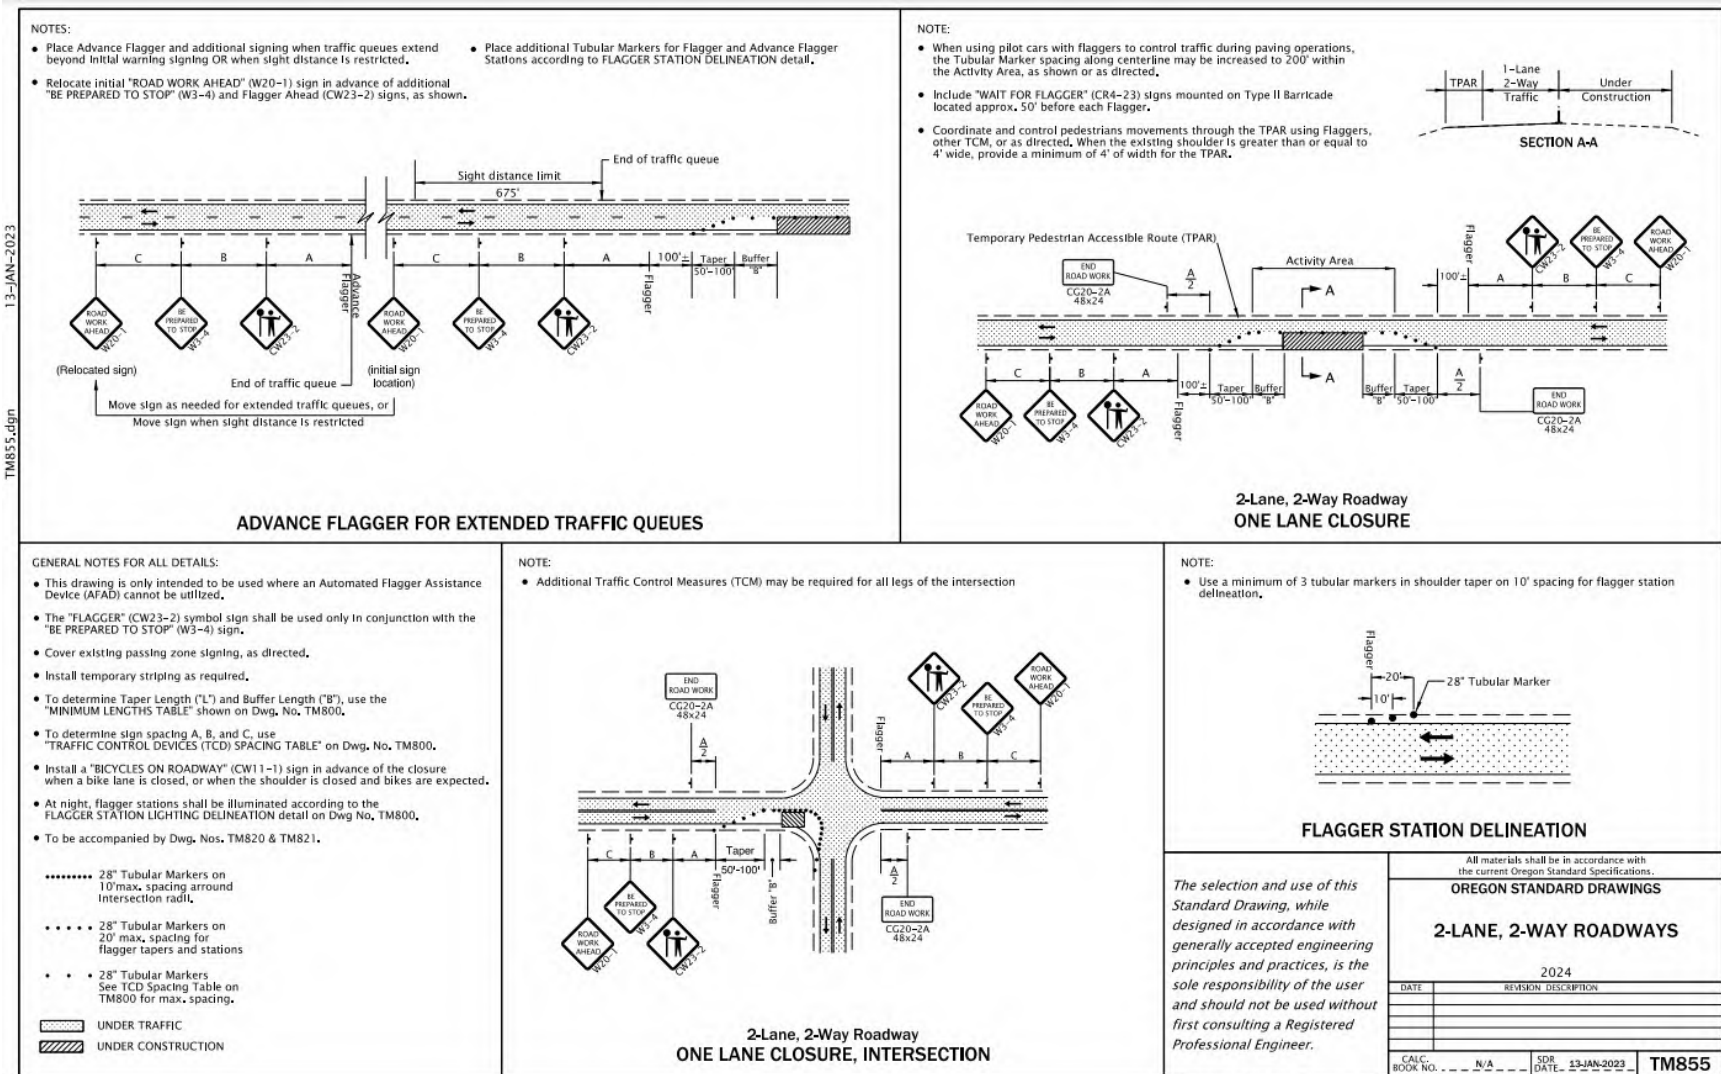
Example ODOT Traffic Control Plan Detail. 2-Lane, 2-Way Roadways – Flaggers.
